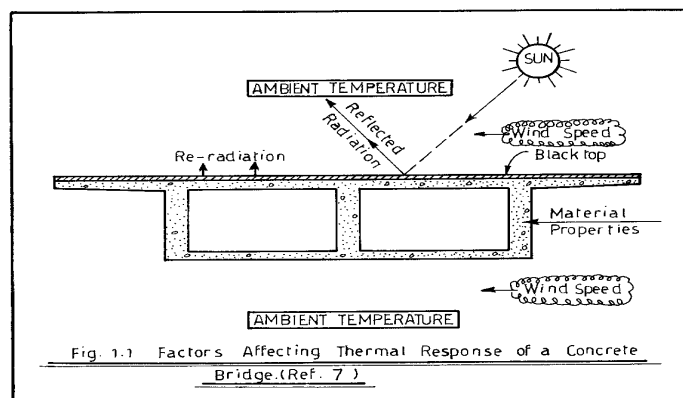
Factors Affecting Thermal Response of a Concrete Bridge. (Priestly, M. J. ,1978)
